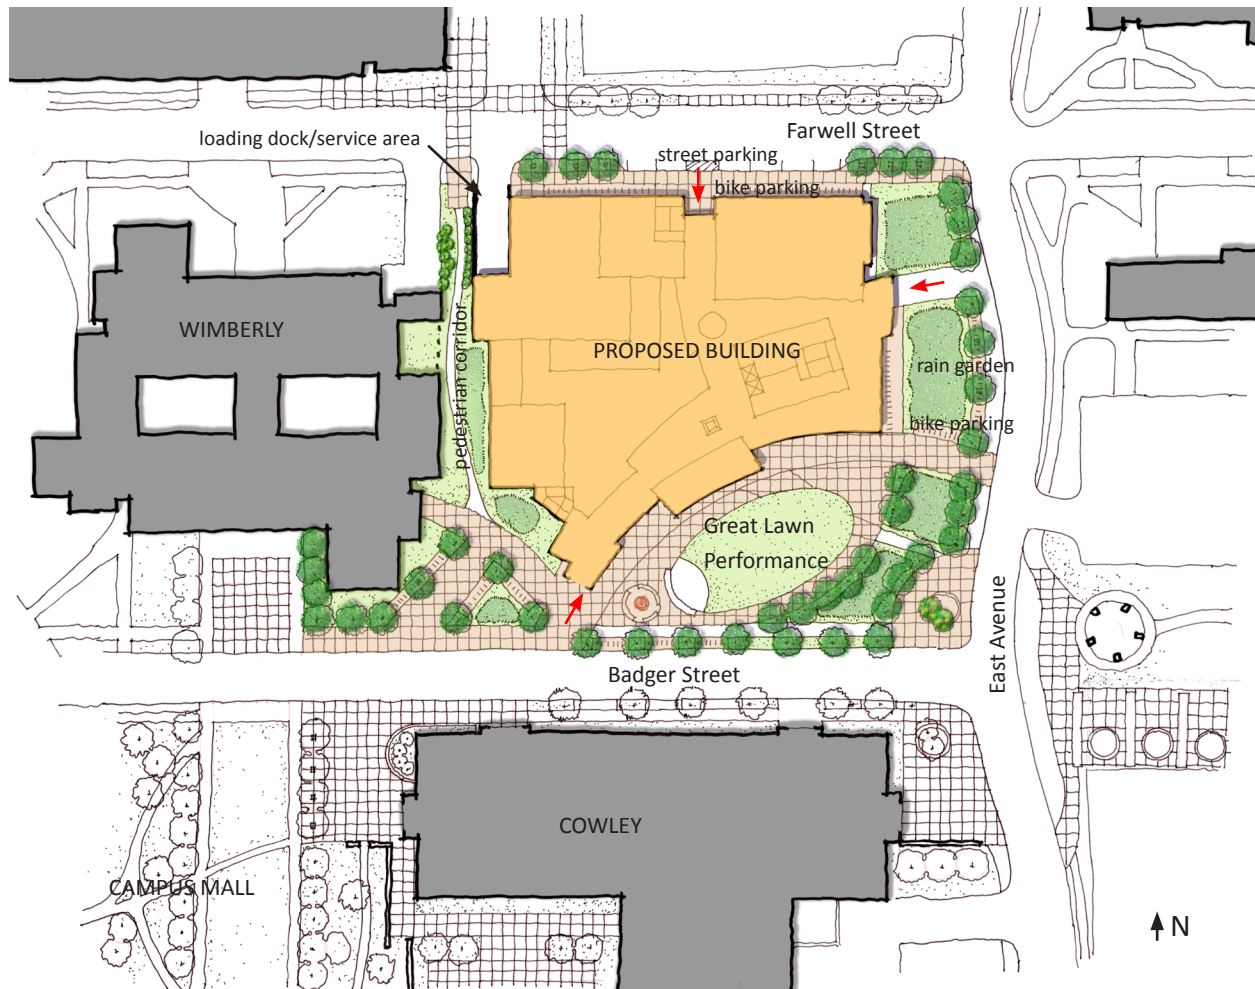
PROPOSED SITE PLAN DIAGRAM
